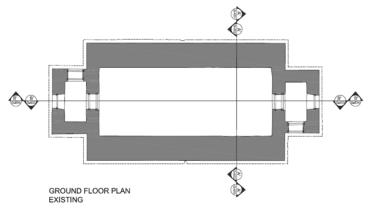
Ground Floor plan of Barood Khana (Source: WCLA)
